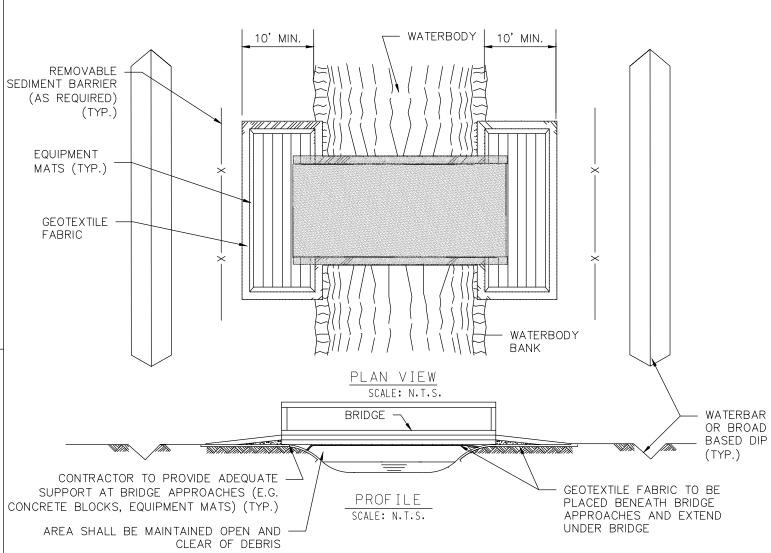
A FREE SPAN BRIDGE EQUIPMENT CROSSING
